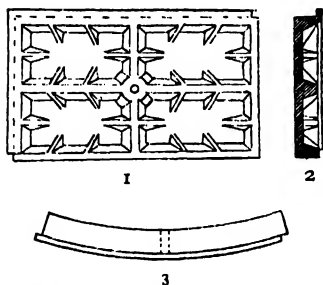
1, Back view of a segment of Cast-iron Tubing, showing ribs, brackets, flanges, and centre hole. 2, Cross-section of segment. 3, Plan of segment.
